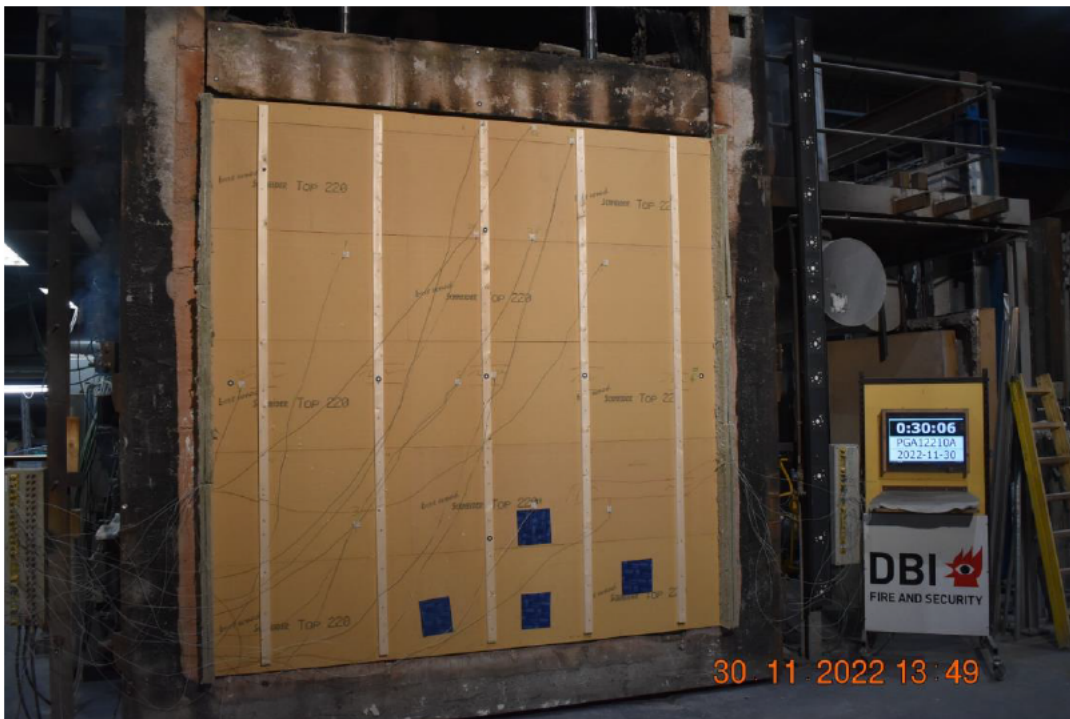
Test specimen seen from unexposed side 30 minutes into the test
